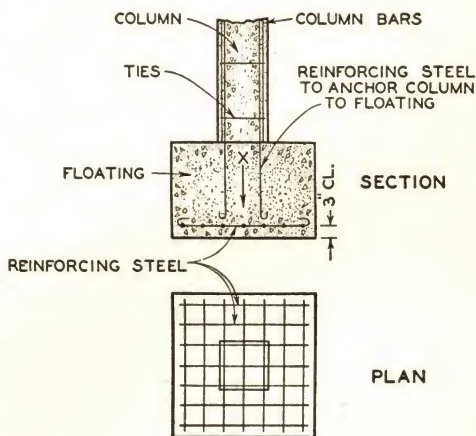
When Columns Carry Extremely Heavy Loads, the Footing Supporting the Columns Must Be Reinforced by Steel Bars
